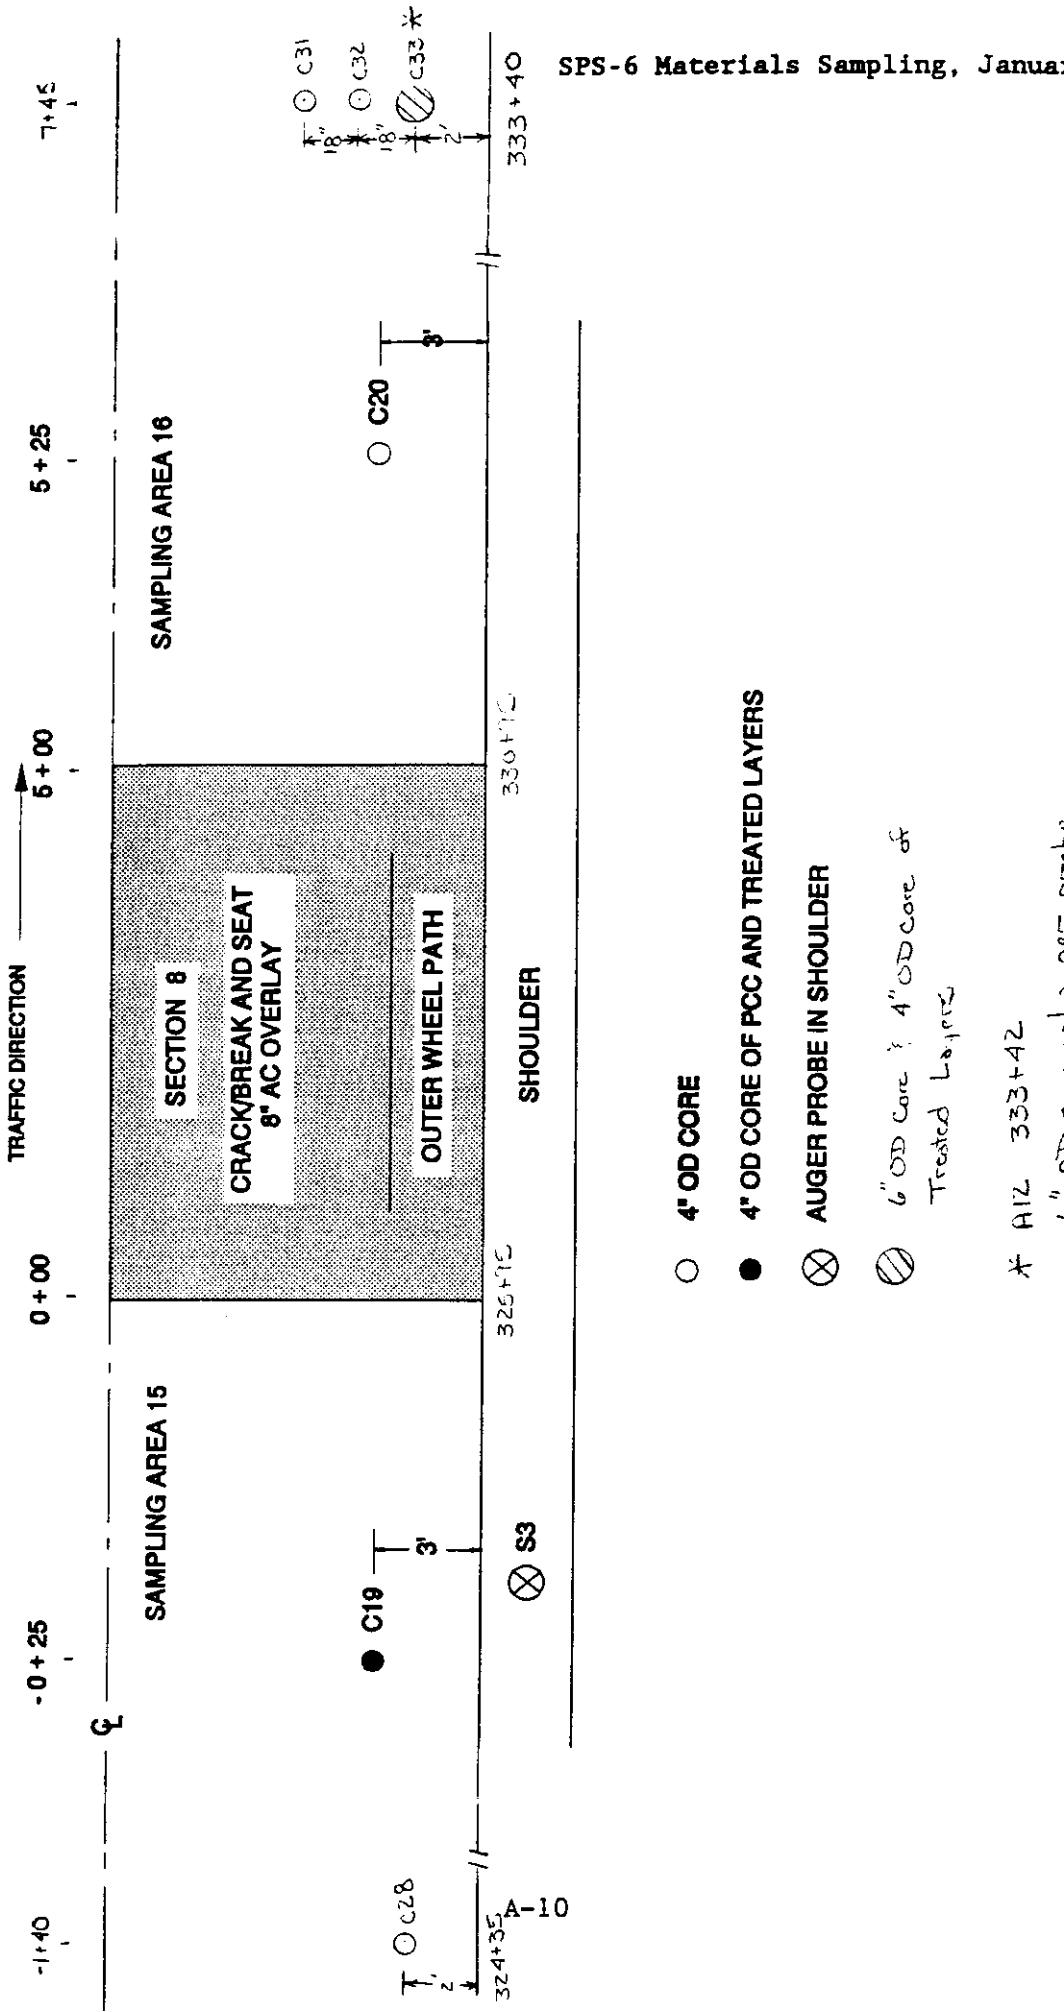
Example of "Pre-Construction" Sampling Plan for Test Section 8
